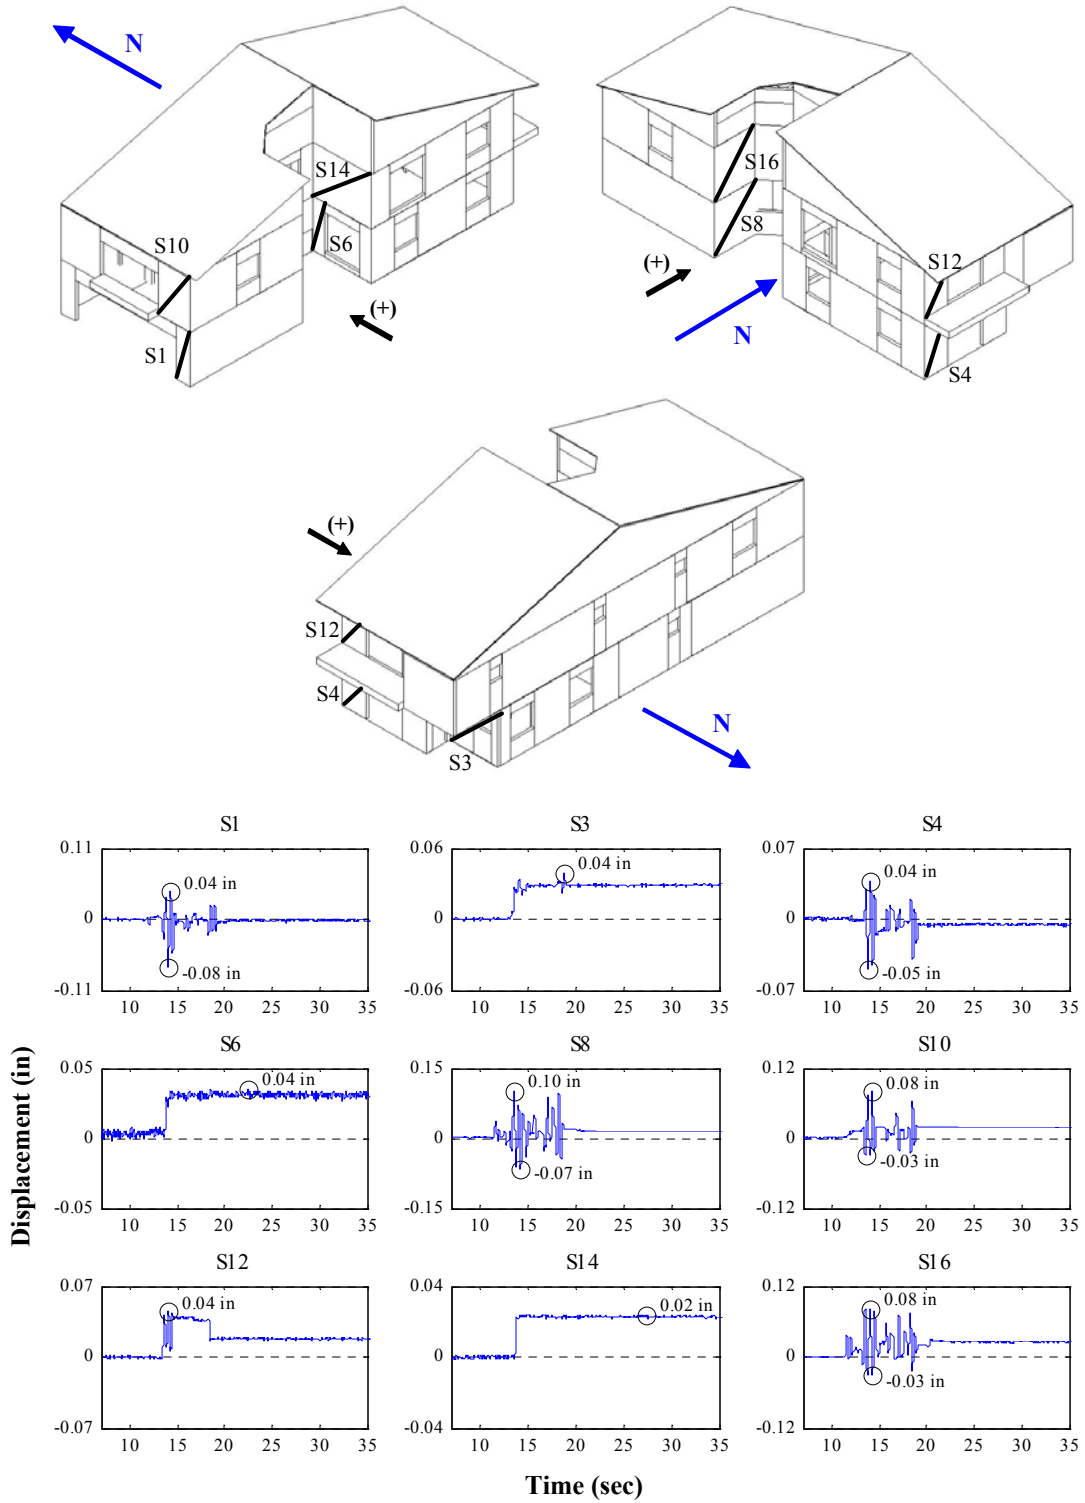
Wall deformations of north-south external walls for Test NWP2S28
